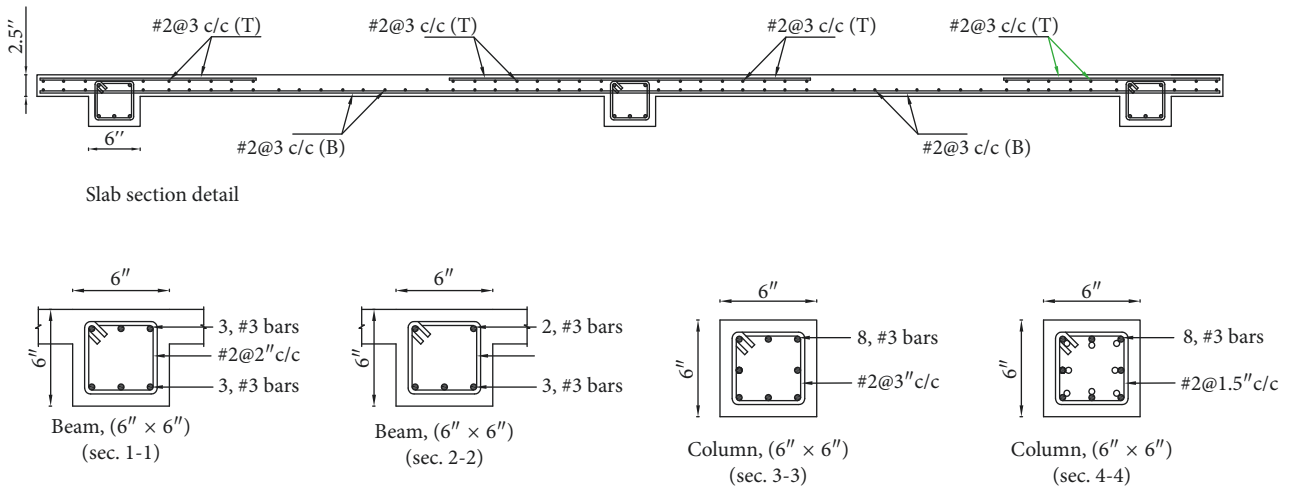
Cross-sectional detail of the RC frame (dimensions in inches).
